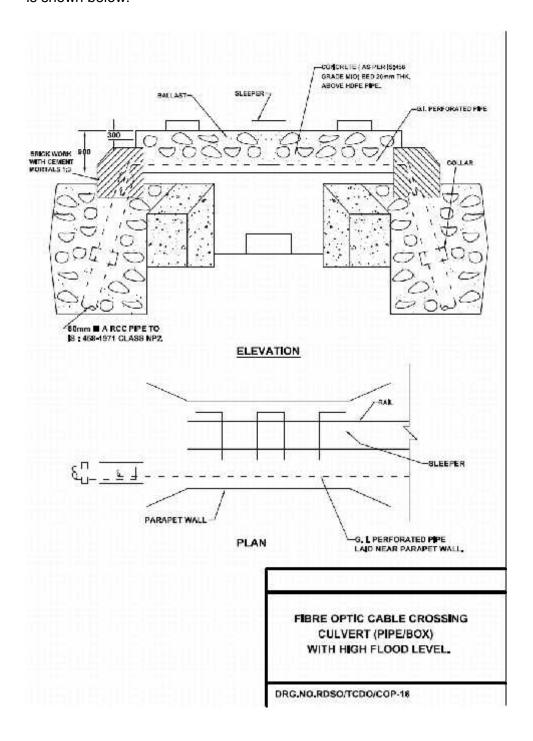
Drawing of protection for crossing culverts with high flood level as per RDSO/TCDO/COP-16
